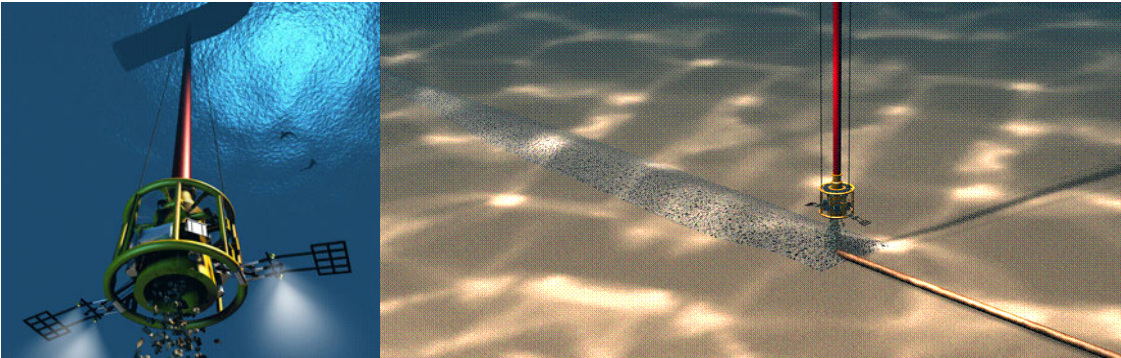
Rock installation by a Fall Pipe Vessel using a Fall Pipe Remotely Operated Vehicle
